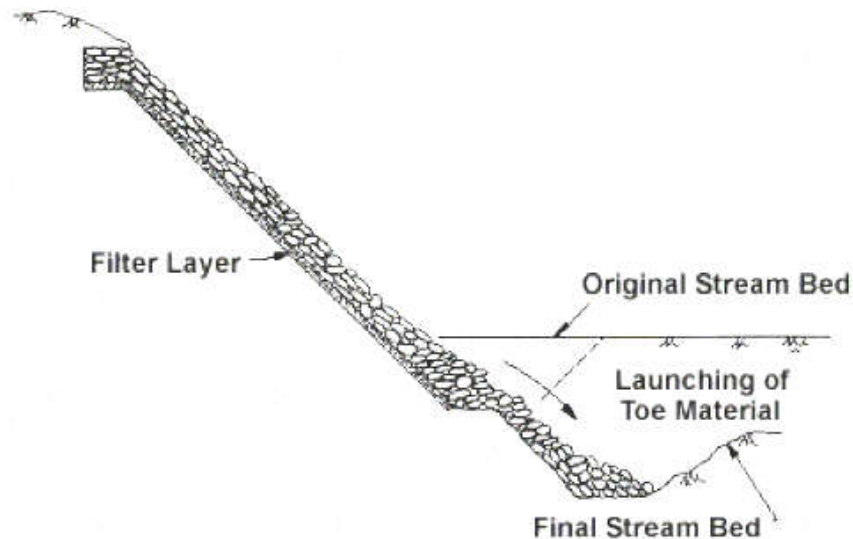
Typical Riprap Installation: End View (bank protection only)
